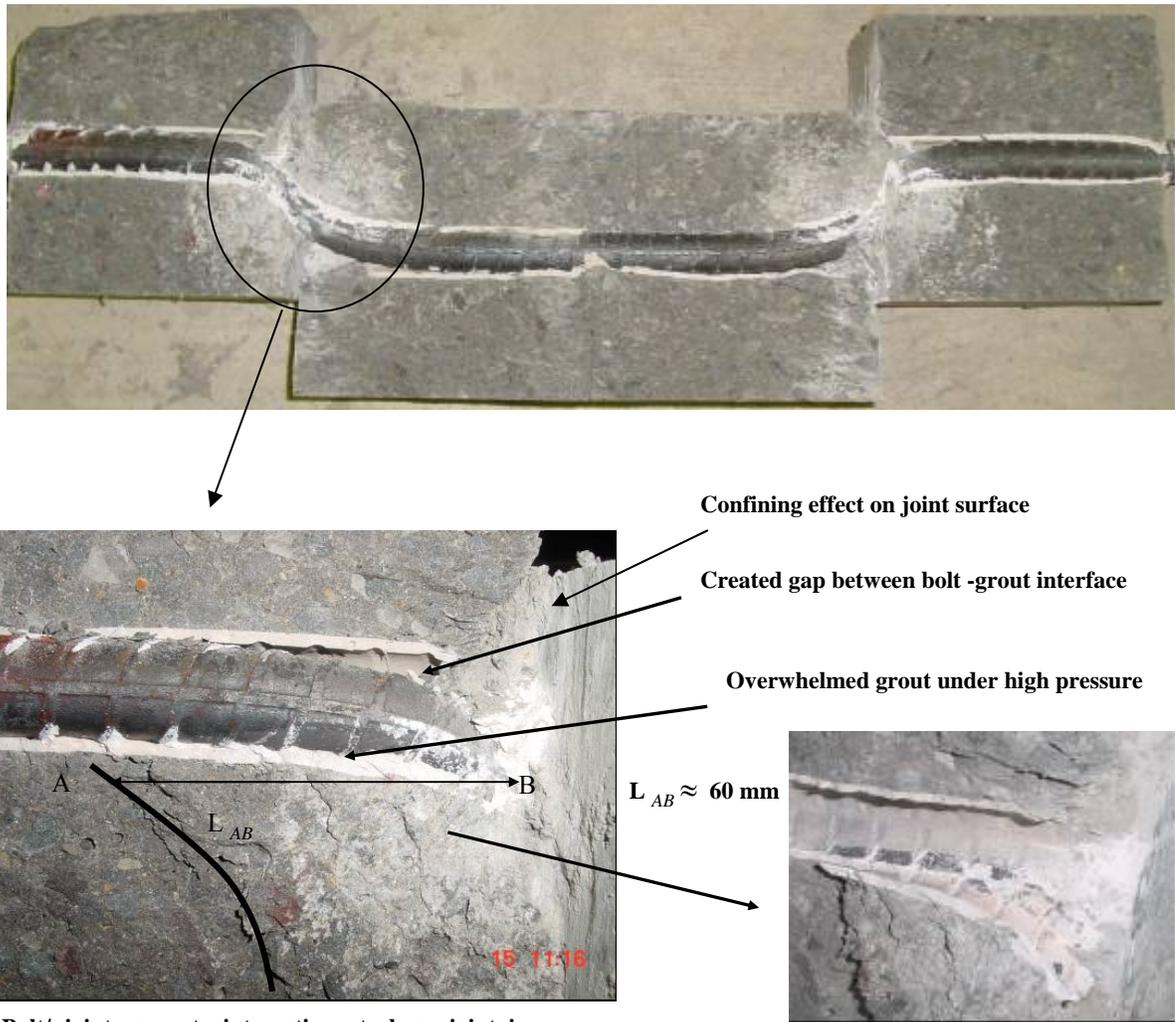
Bolt/ joint concrete interaction at shear joint in concrete 100 MPa and 80 kN pretension load
